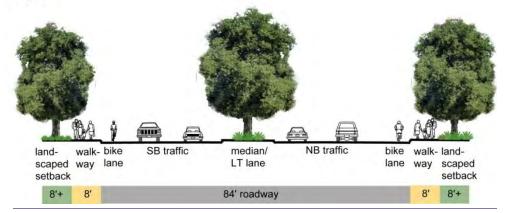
B Cabot Road: Cross Sections—Looking North
